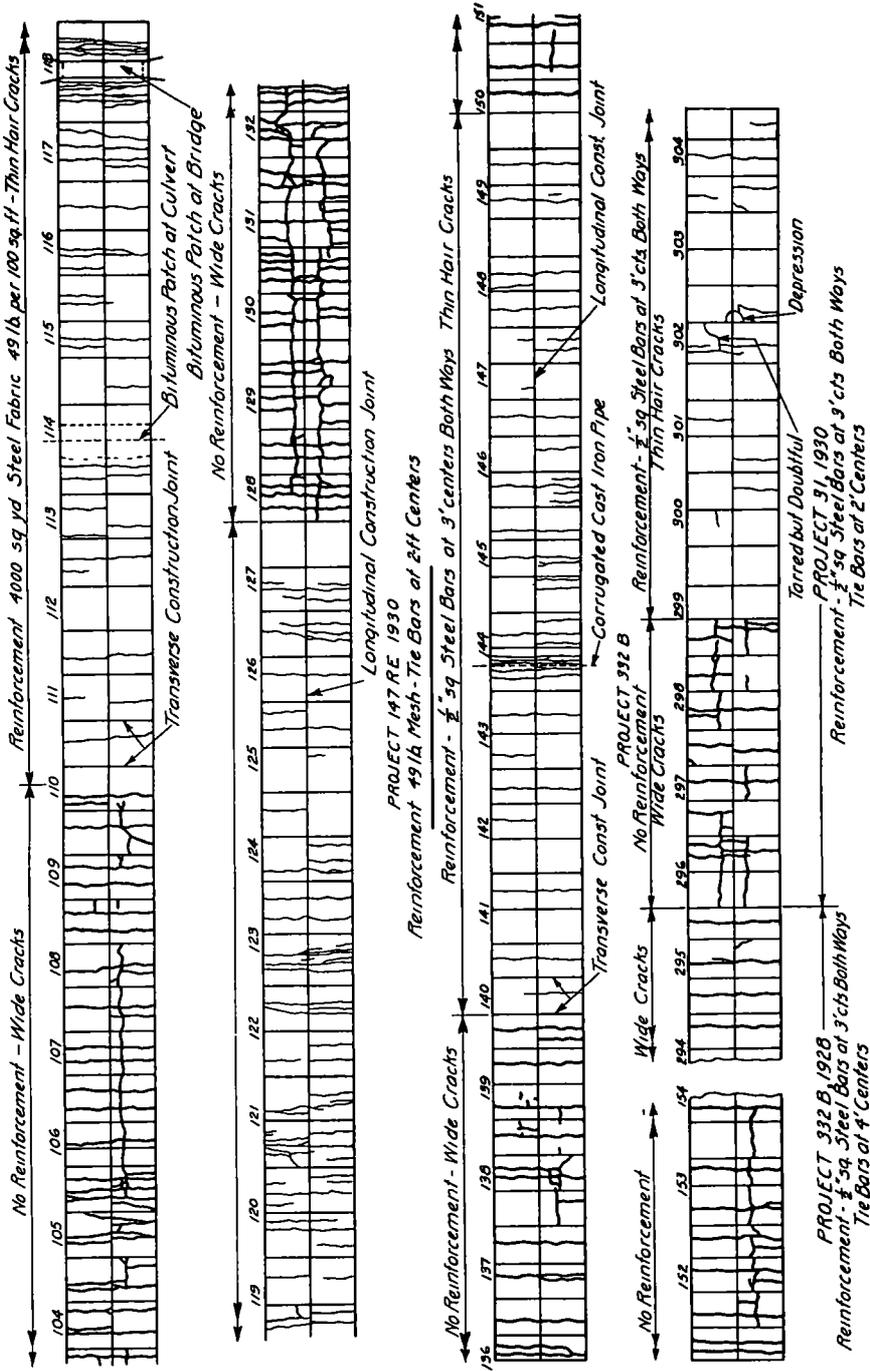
Survey of Cracks in Concrete Pavements. Clark and Taylor Counties, Wisconsin
